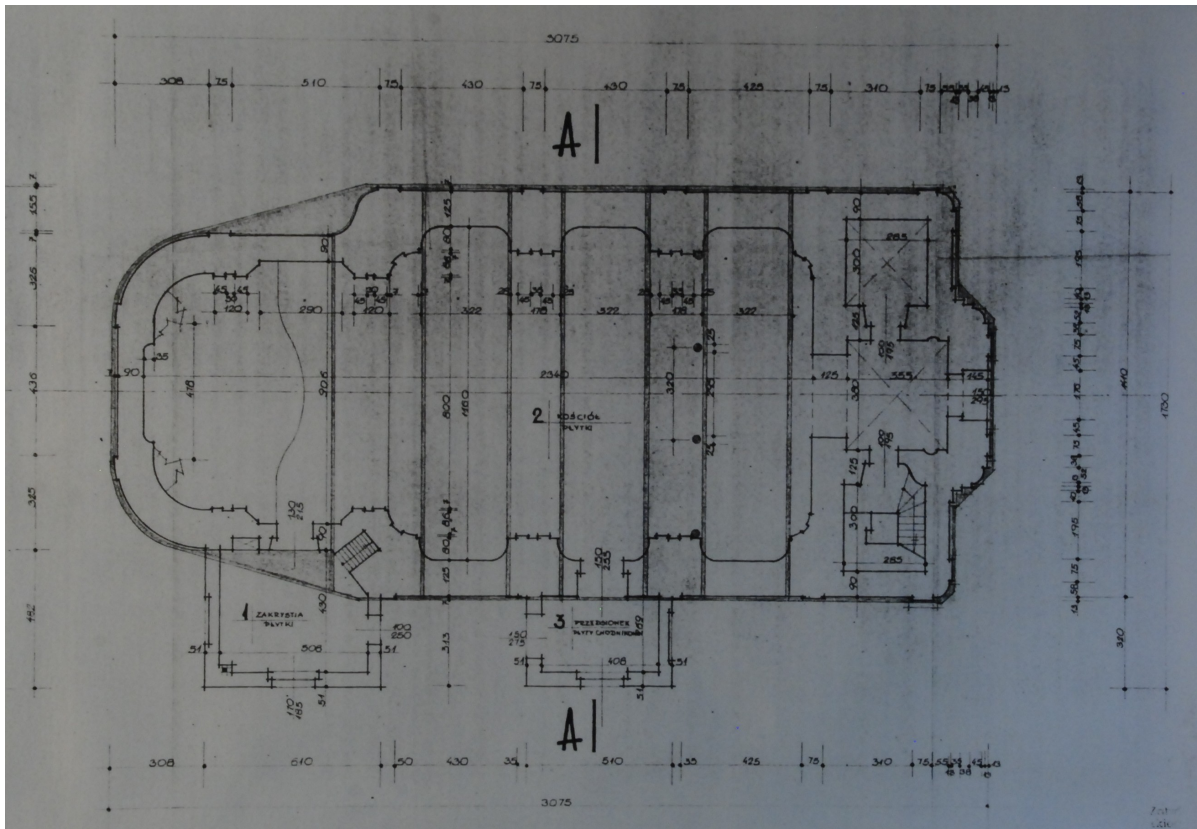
Horizontal cross-section from which most dimensions relating to the structure can be retrieved.
